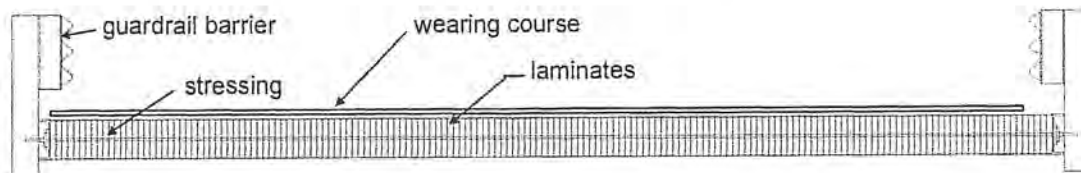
Section through a Stress Laminated Timber Plate Bridge Deck
